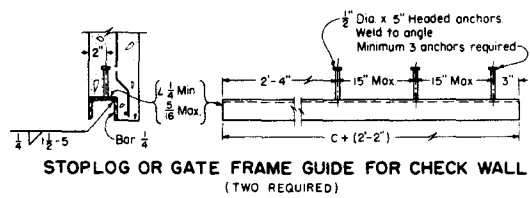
Standard dimensions for a 3-foot check-drop structure. (Sheet 1 of 2.) 103-D-1212
